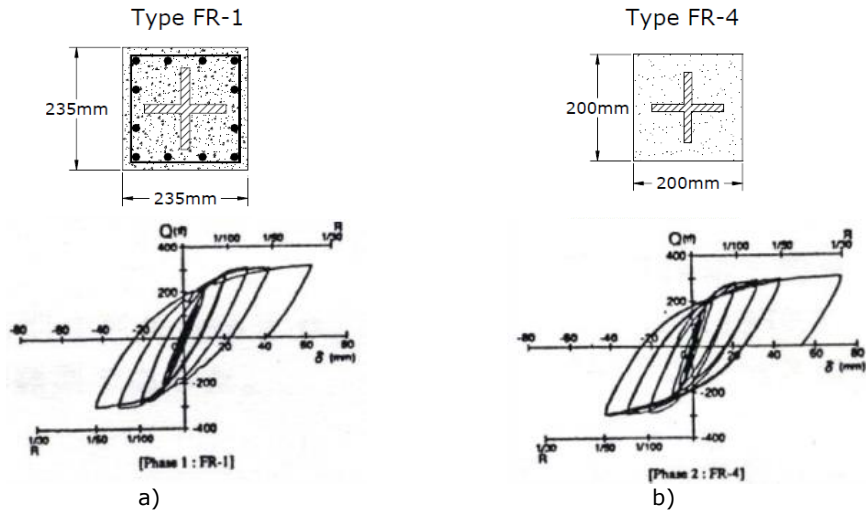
BRBs tested by Horie et al.: a) steel bar reinforced concrete BRM, b) steel fiber-reinforced concrete BRM [19]
